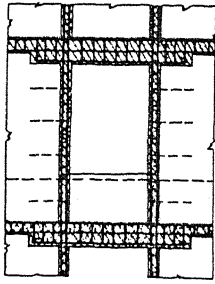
STRENGTHENING OF PIERS AND LINTELS OF BRICK BUILDINGS
